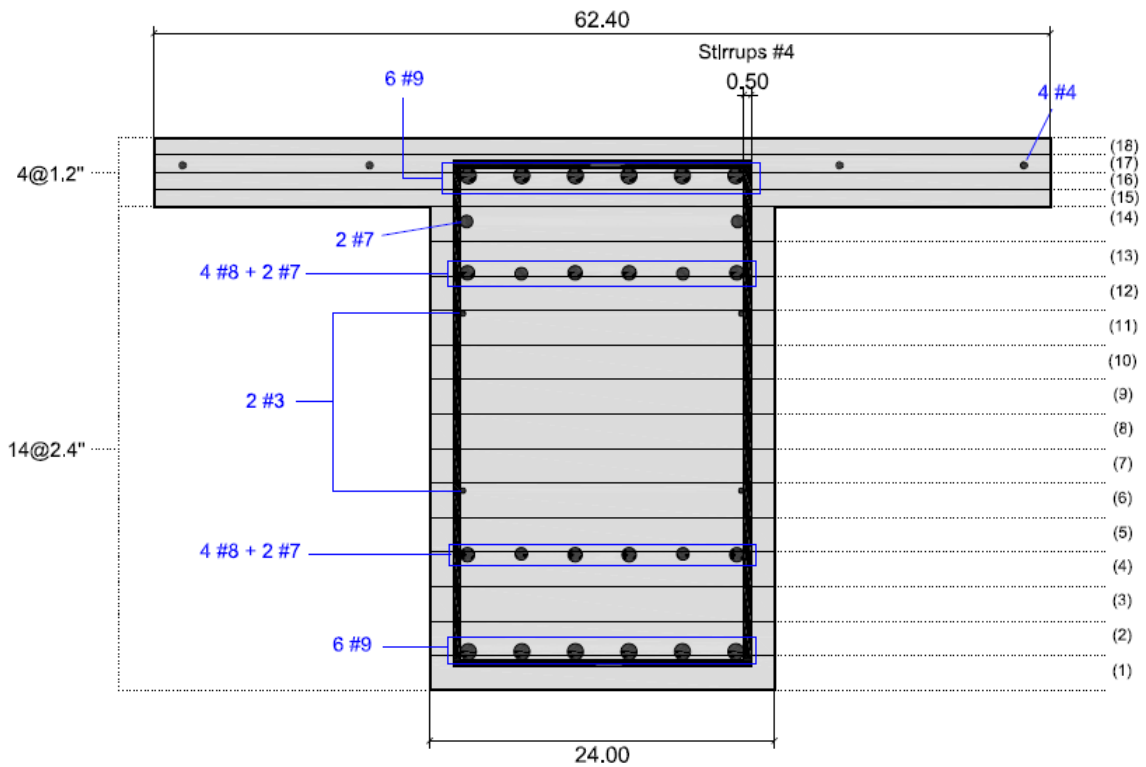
Cross section 2 for Specimen 1. Dimensions in inches.
